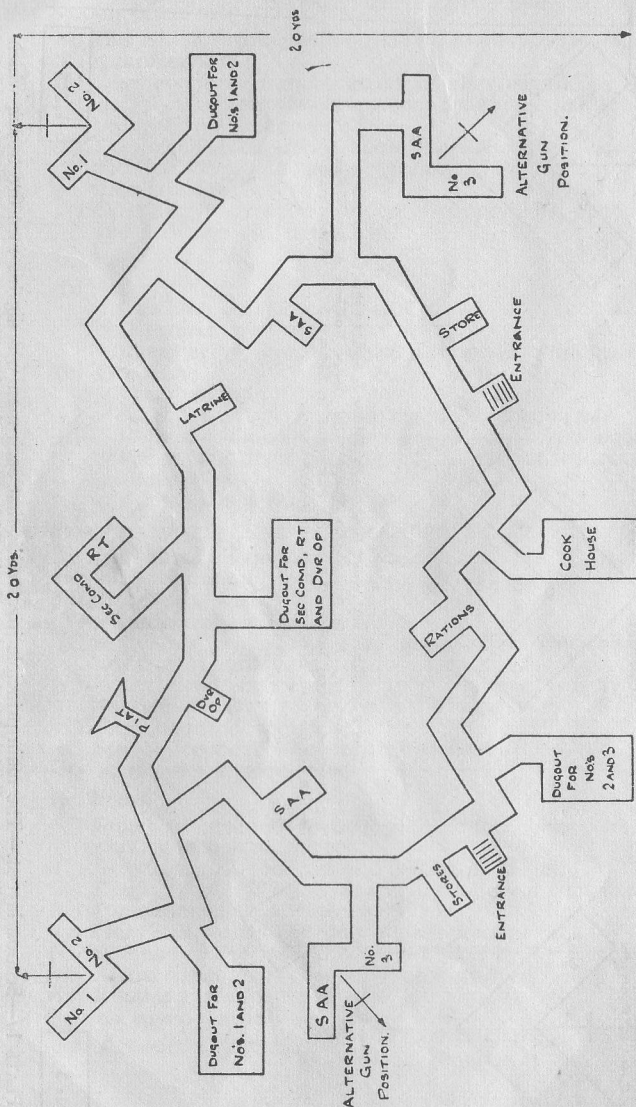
DIAGRAMMATIC LAYOUT OF THE DIGGING PLAN OF A SECTION POSITION
